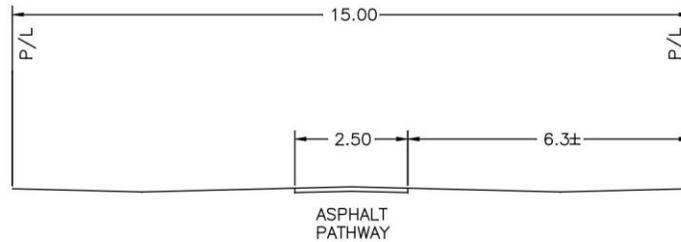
SECONDARY PATHWAY – MID-BLOCK CONNECTIONS
